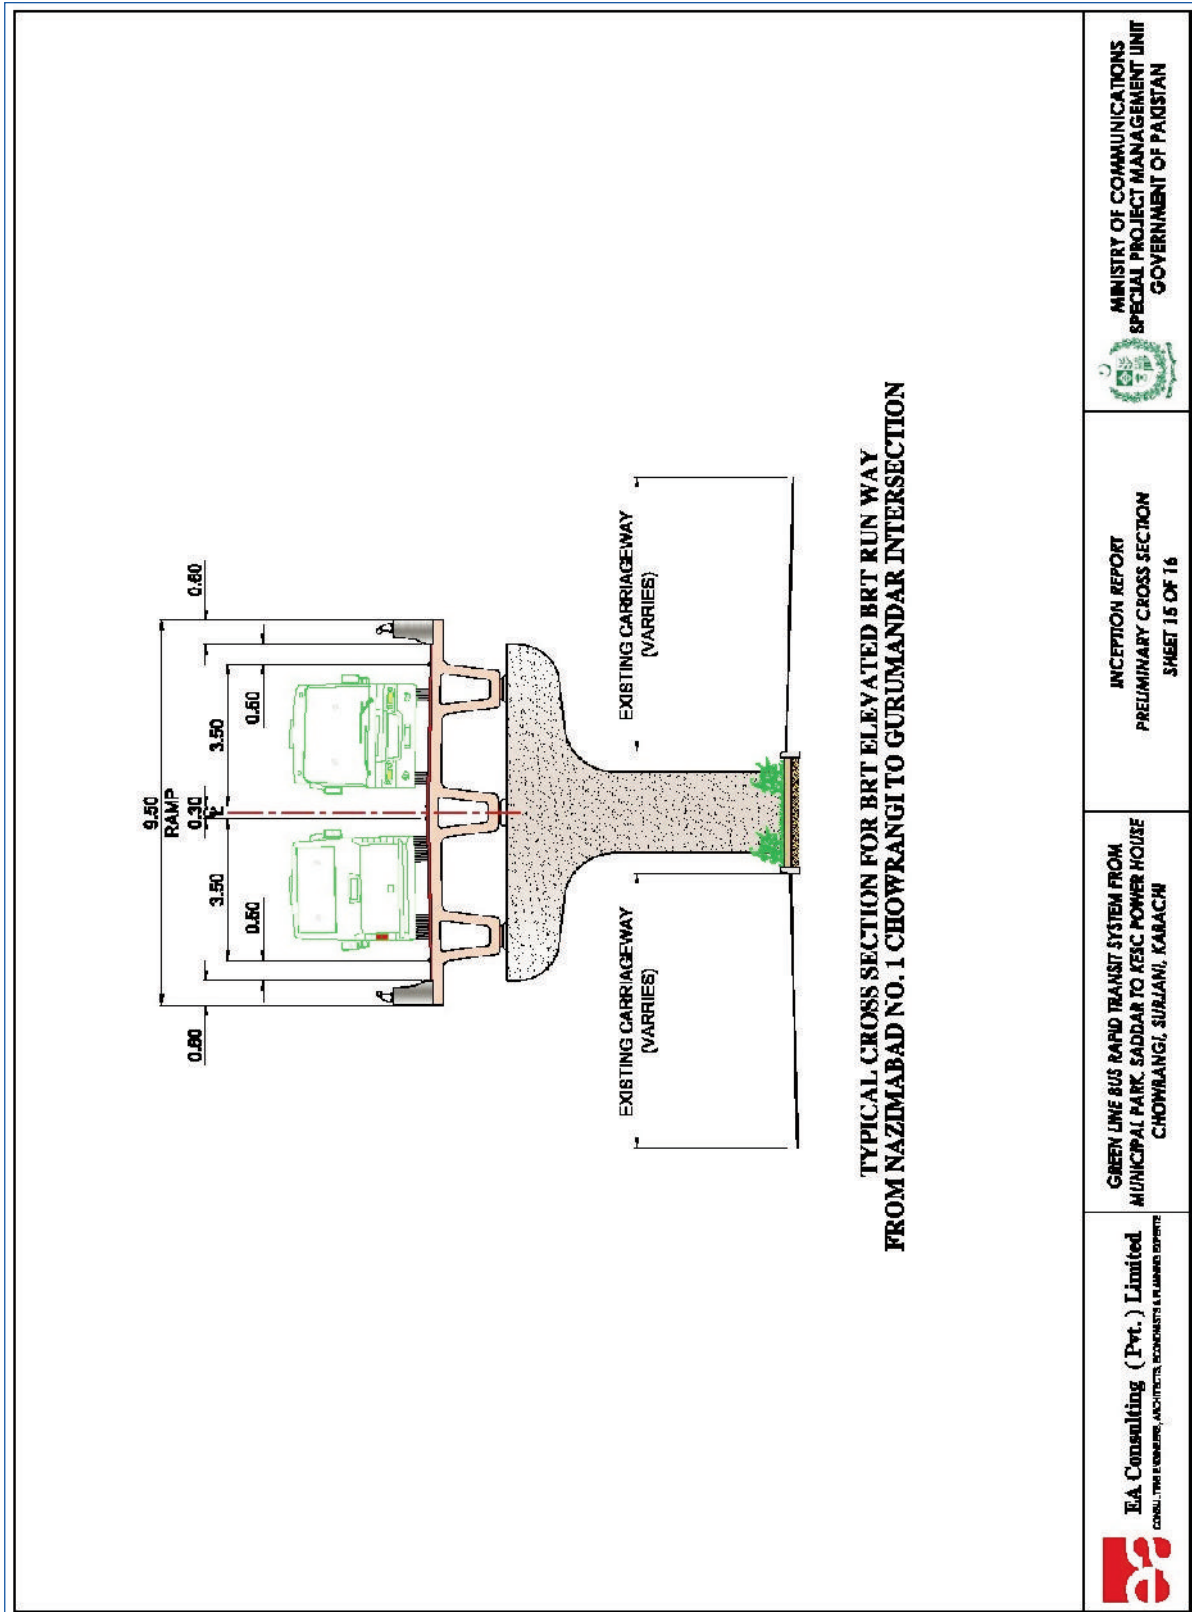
Segment 4: X-section of BRT Elevated Runway
